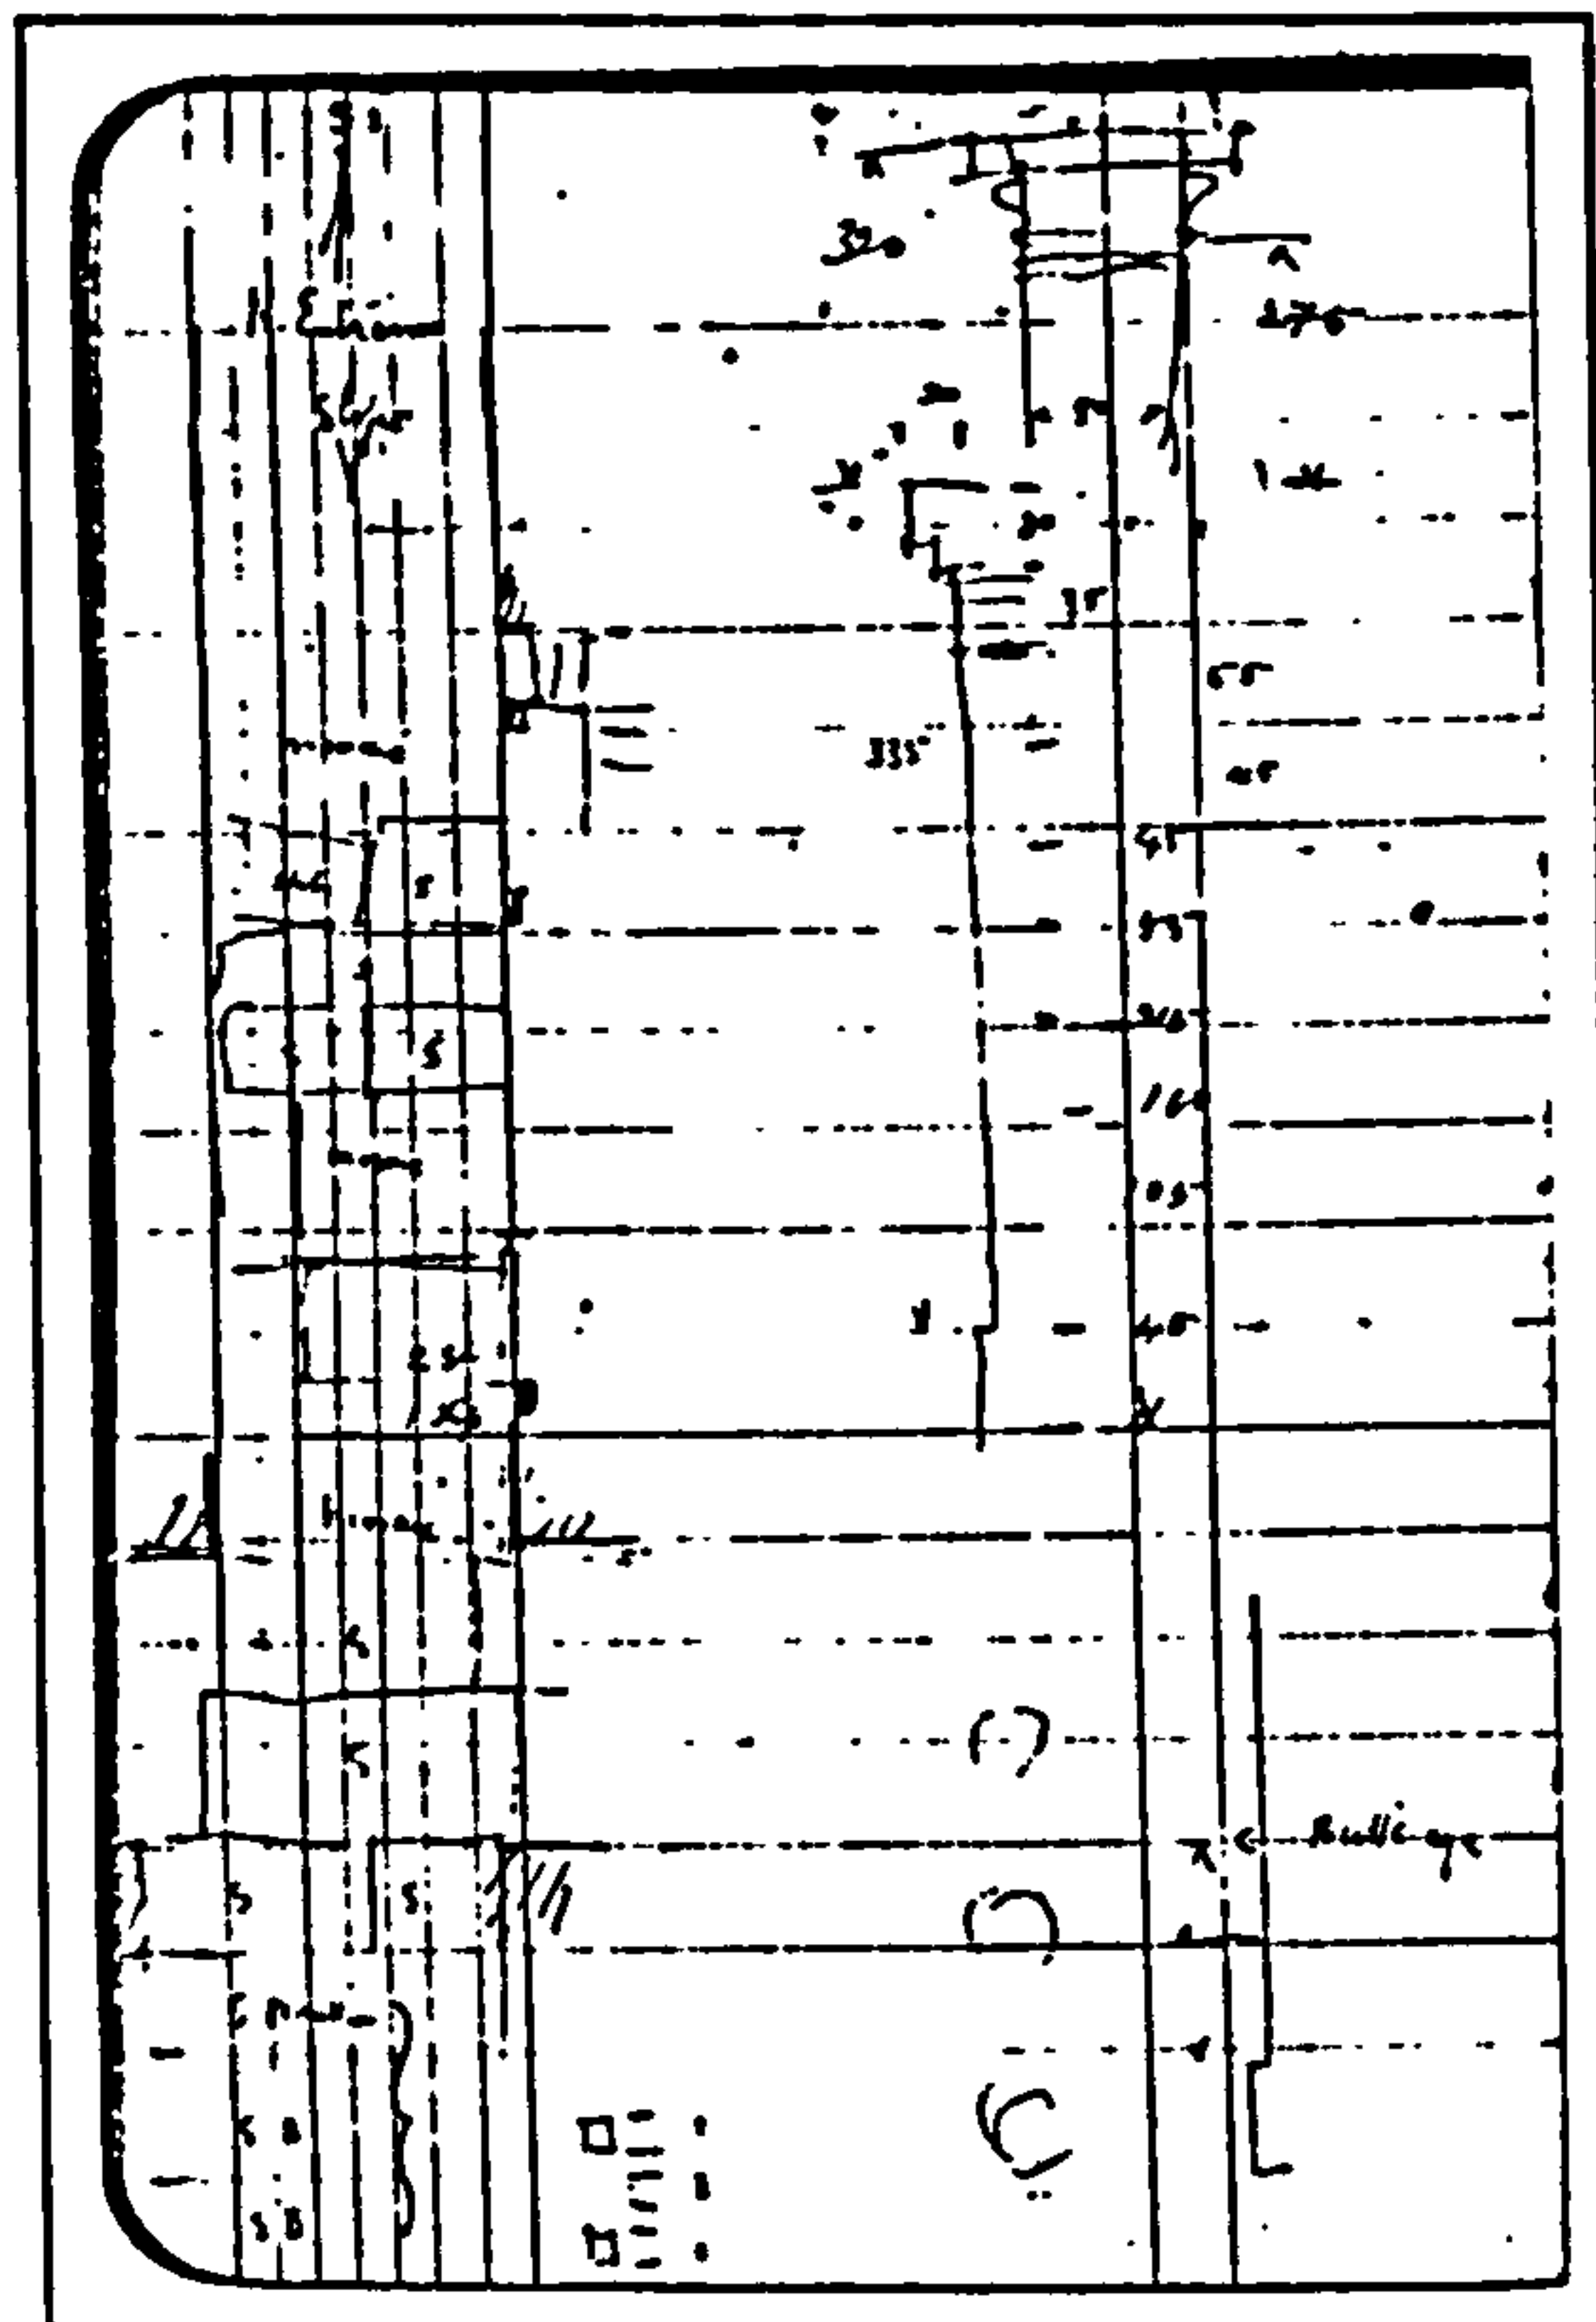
Sketch plan and section of the proposed reconstruction of the western portico of the North Entrance Passage. Notebook Piet de Jong.
